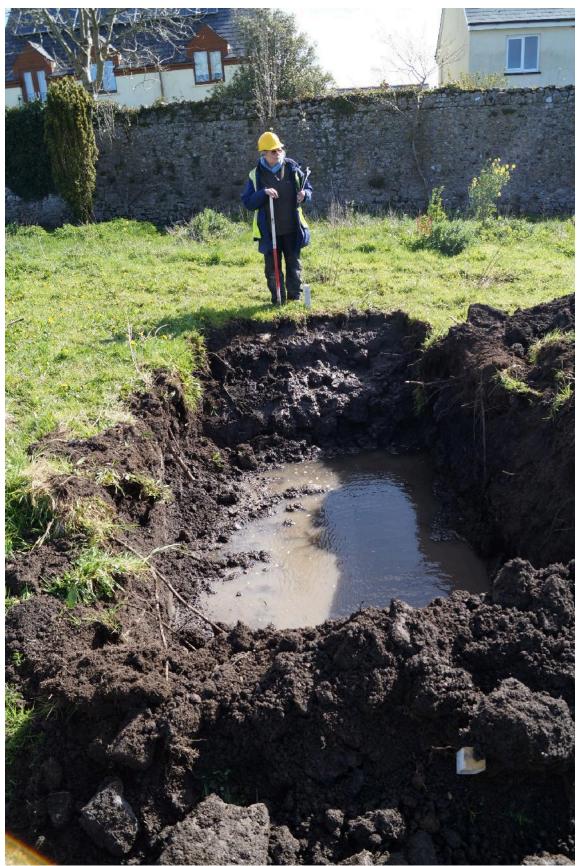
GGJ2016\_134, Excavation for part of drainage system, showing layers of made up ground, looking southwest.
